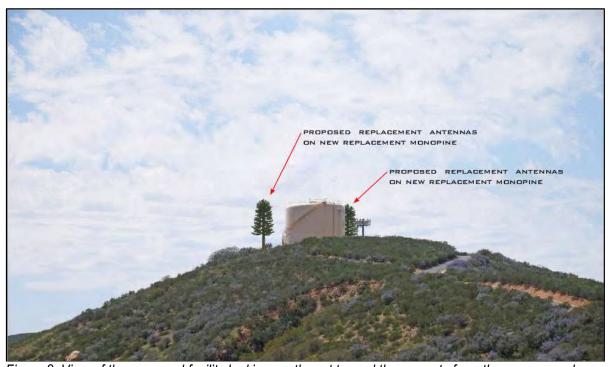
View of the proposed facility looking southwest toward the property from the access road.
